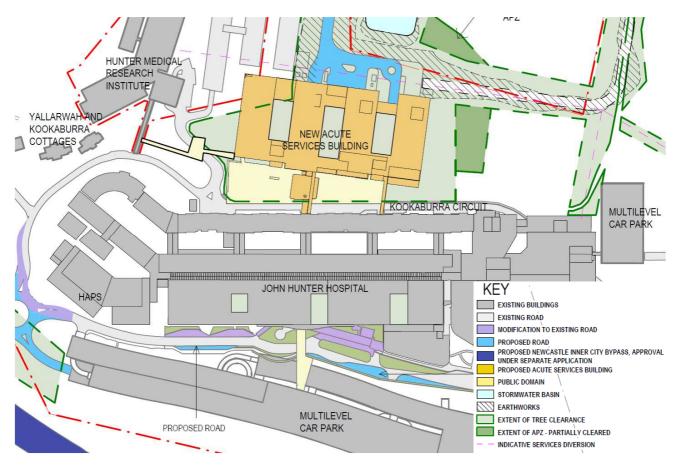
ASB and existing John Hunter Hospital site plan Source: BVN
